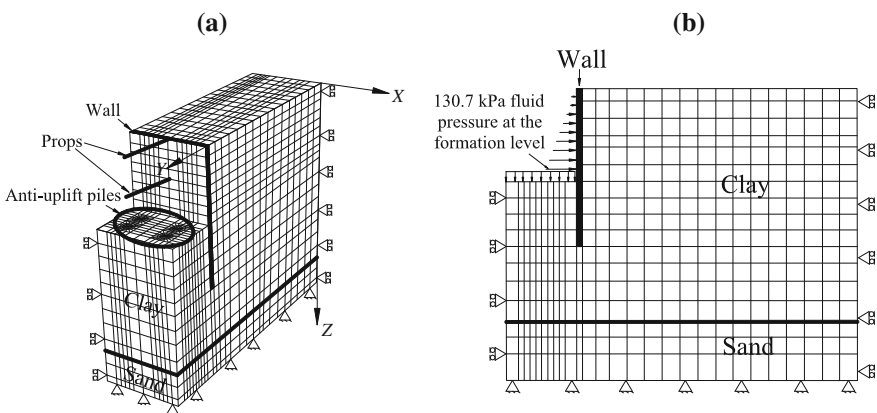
Finite element mesh and boundary conditions simulating the excavation installed with piles (i.e., C_0.4P). a Isometric view. b Elevation view
